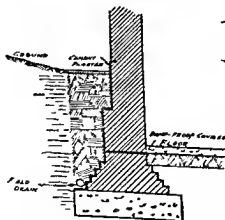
Section of a retaining wall with cement or rock asphalt vertical course and asphalt damp-proof course. Note the field drain covered by dry stone infilling.
